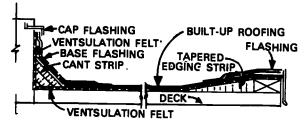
Application of ventsulation directly to the roof deck, with a built-up roof over it
